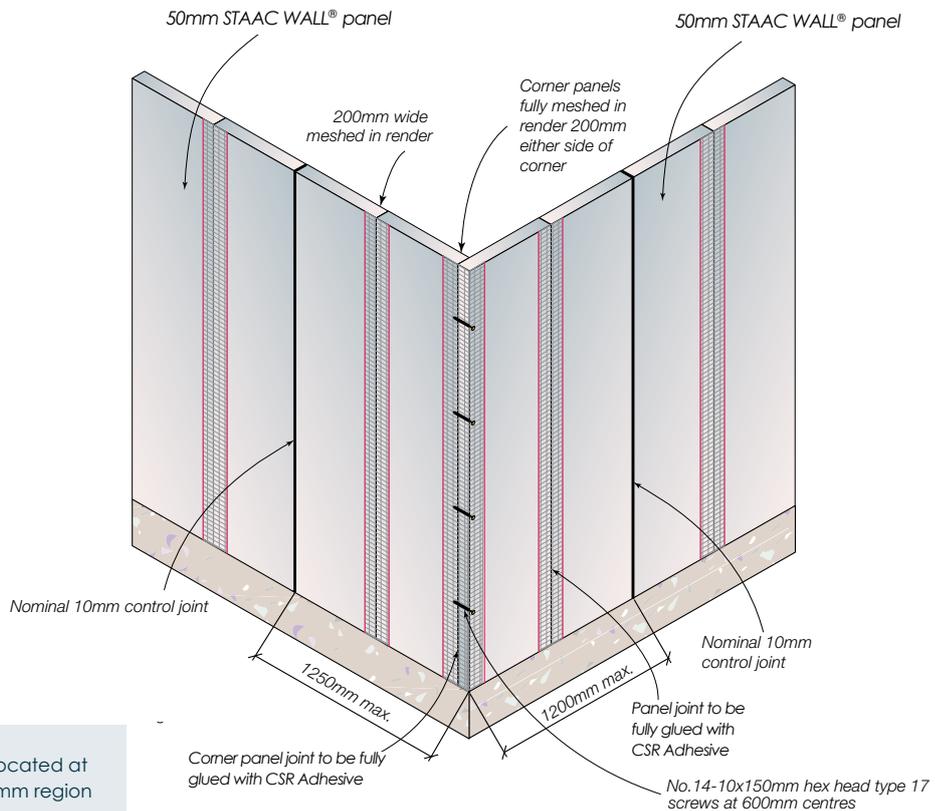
External corner (Achieves FRL 90/90/90 when installed as part of the wall system.)
